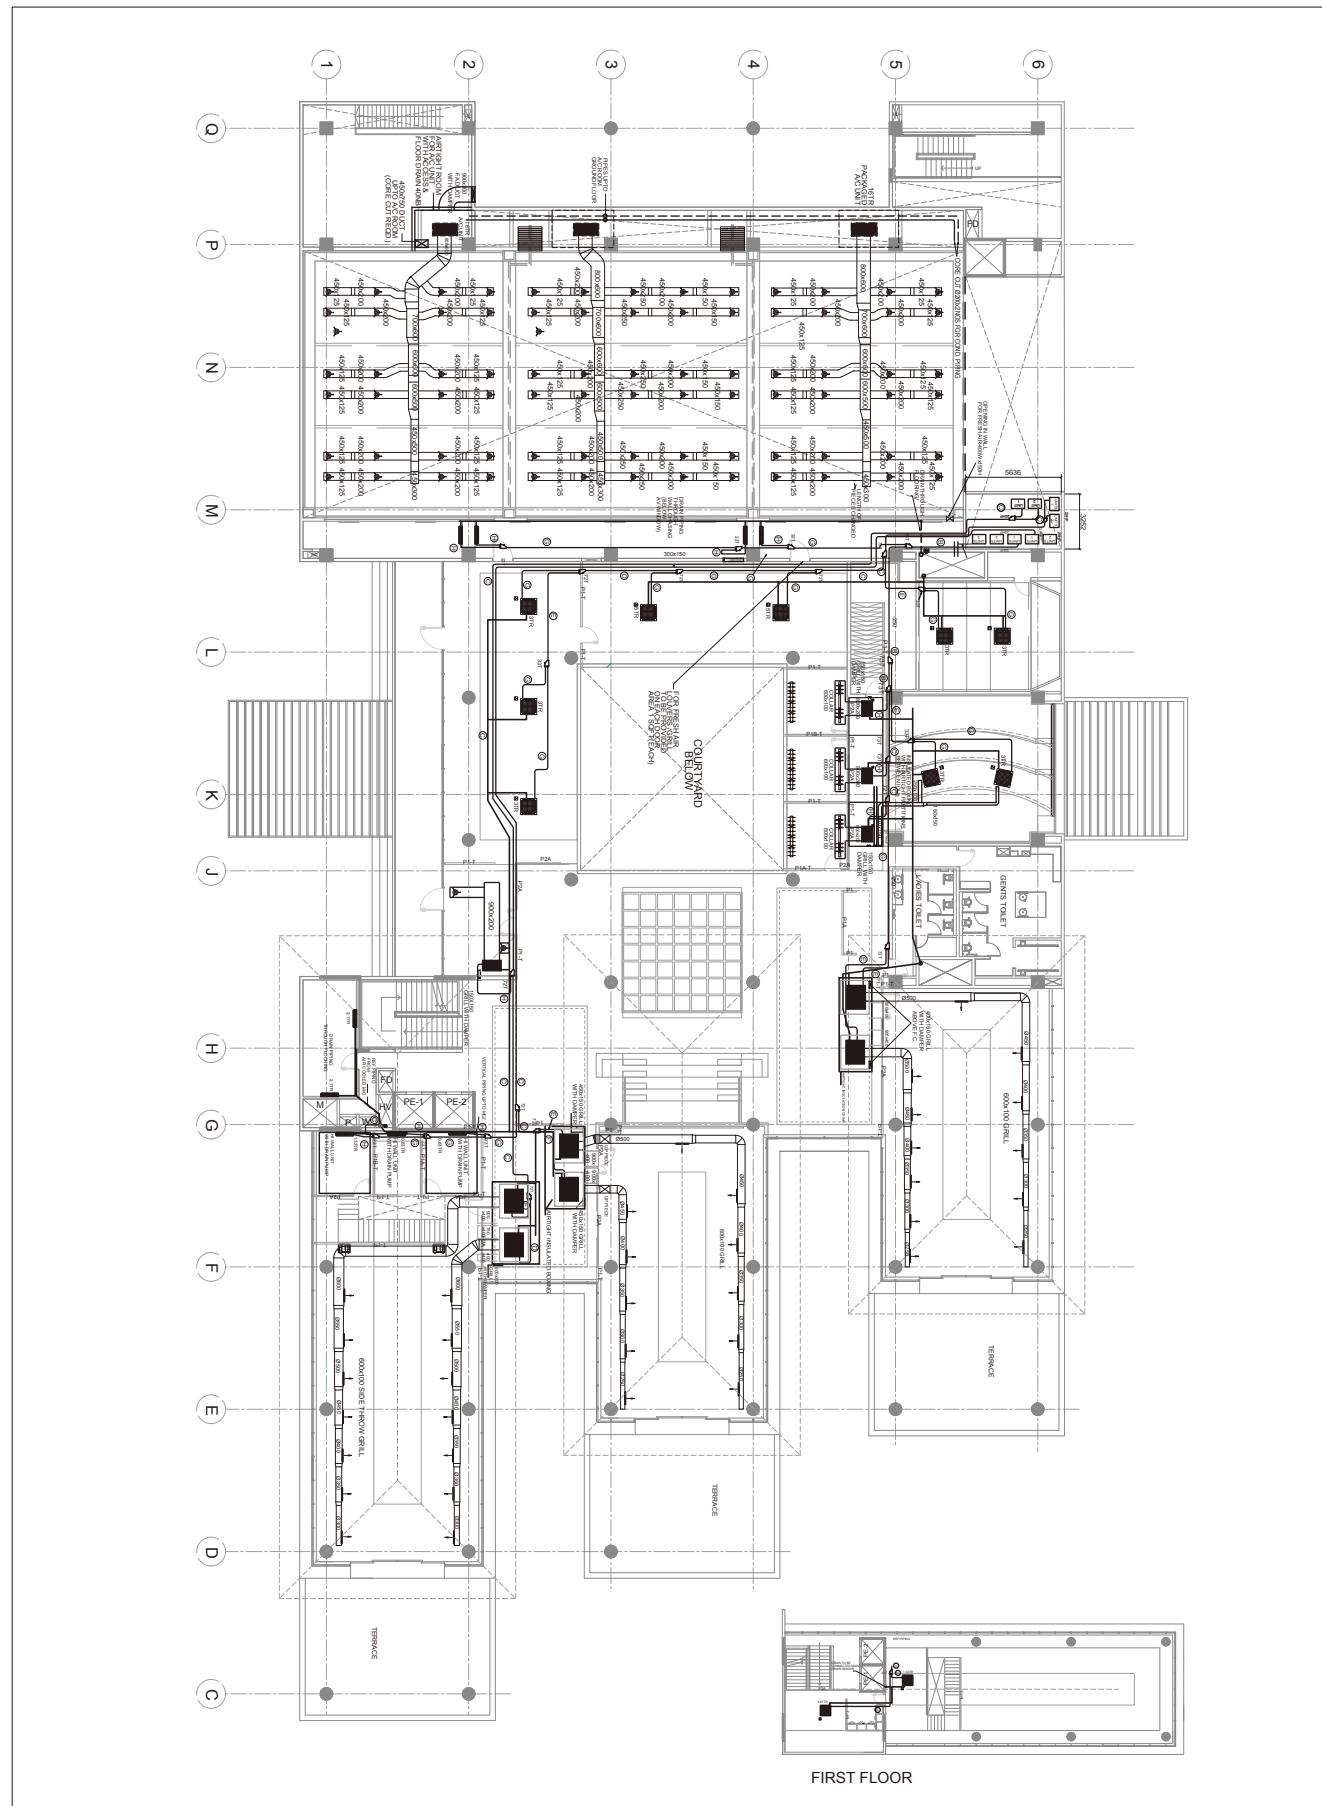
Design Drawing, Piping Drawing Indoor Unit and Outside Unit Location
